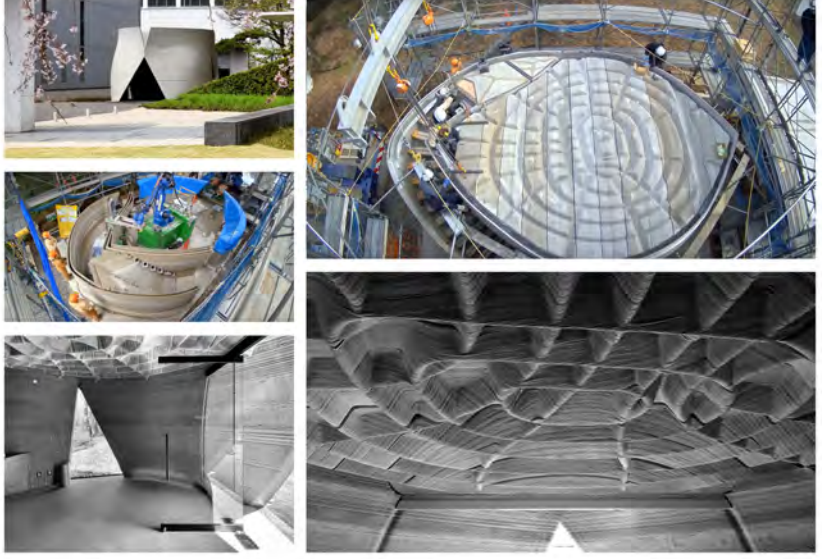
The 3dpod is a 34 m² demonstration building completed in March 2023 in Kiyose, Japan. Structurally, the Slab is made of 3DCP stay-in-place formwork which is later cast with fibre-reinforced SCC. Multi-layered walls are also filled with SCC and include a ventilation system and insulation layer. Images from [88].
